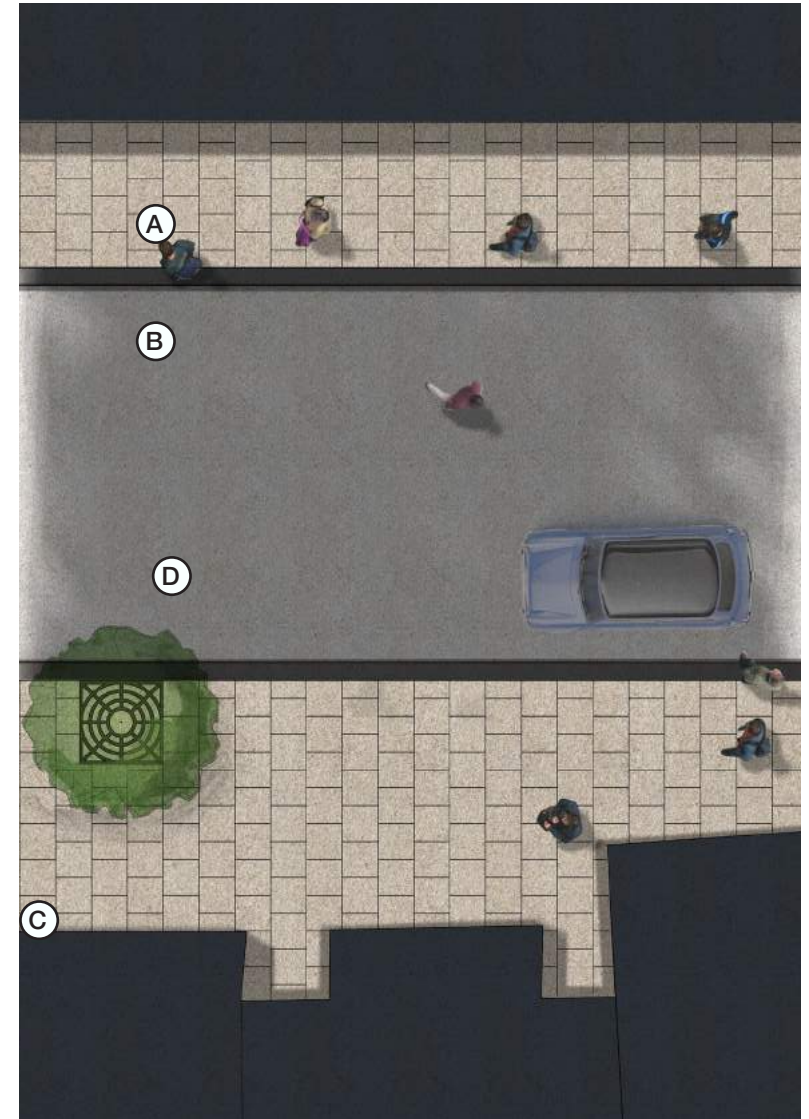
Concept sketch plan illustrating typical layout and materials of the street (Example Railway Street between South Street and Bircherley Green)
